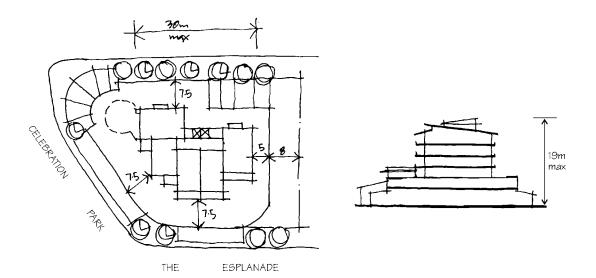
Kings Beach Shop Key Site Design Acceptable Solutions (continued).
